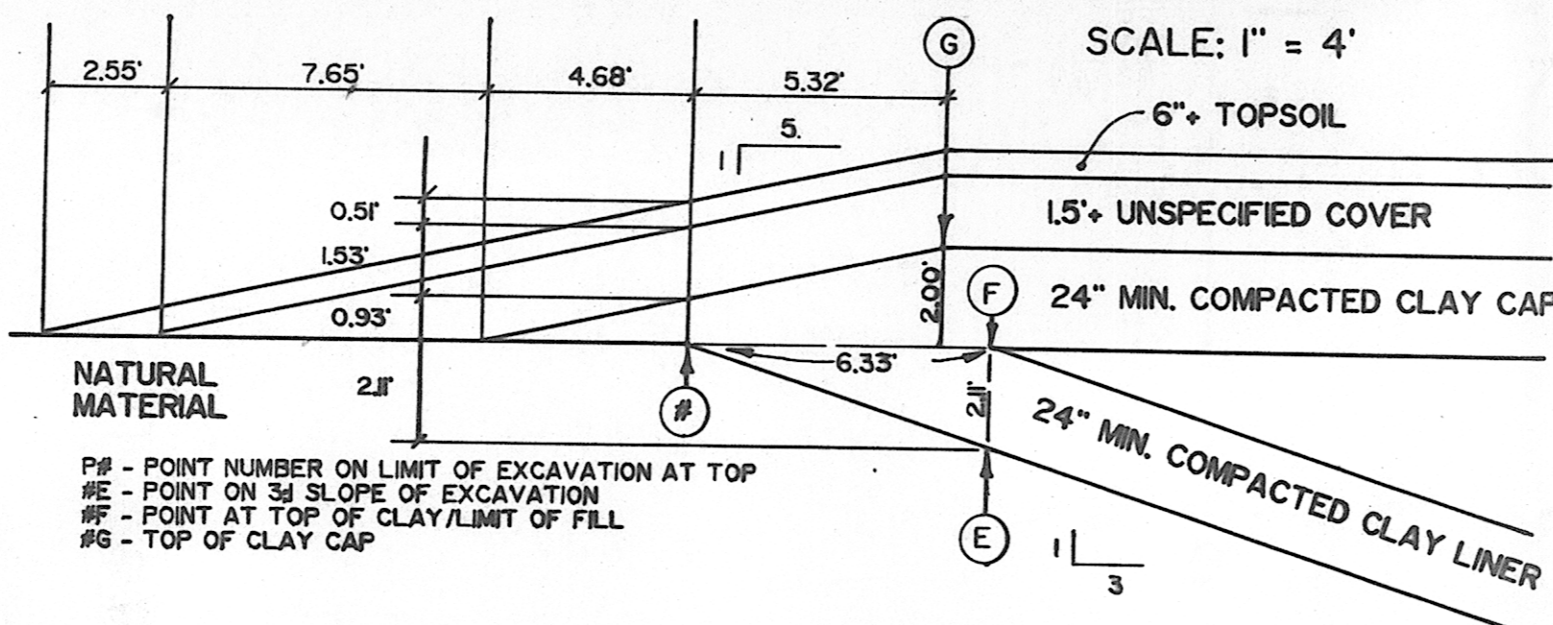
DETAIL B - TYPICAL LINER @ TOE - SIDE VIEW
